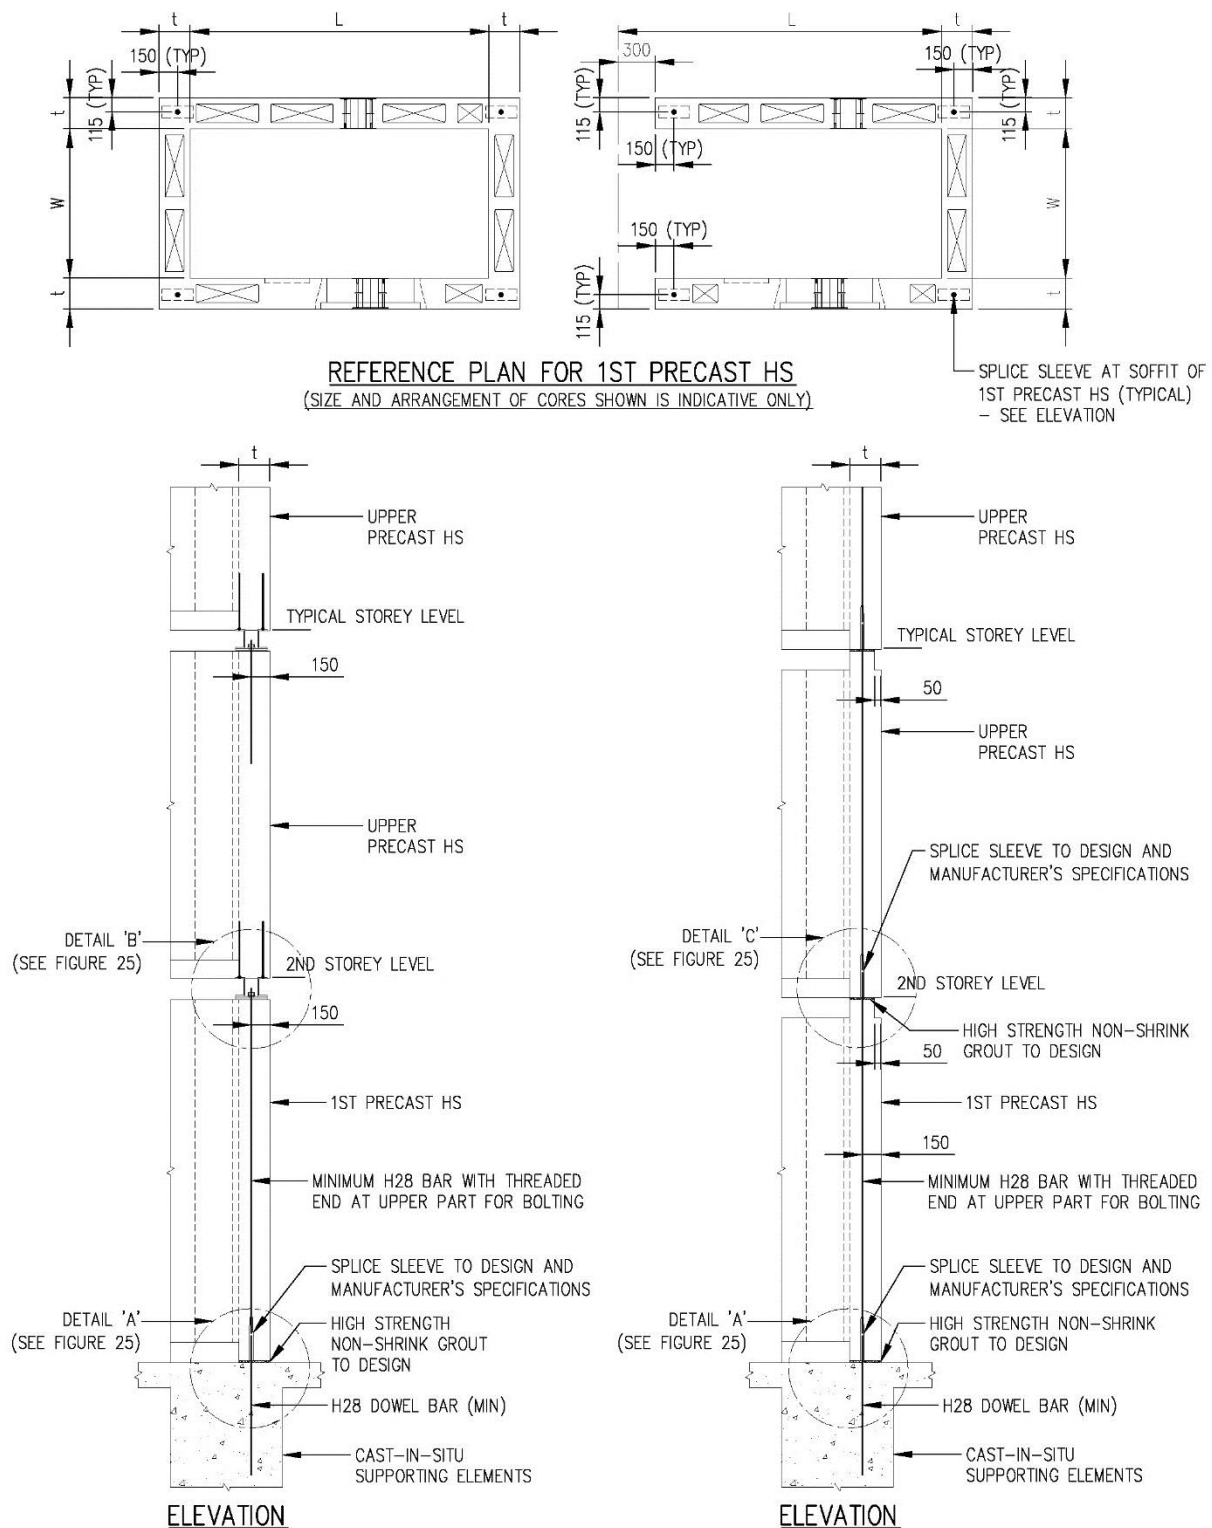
SPLICE SLEEVE CONNECTION DETAILS FOR PRECAST TOWER
